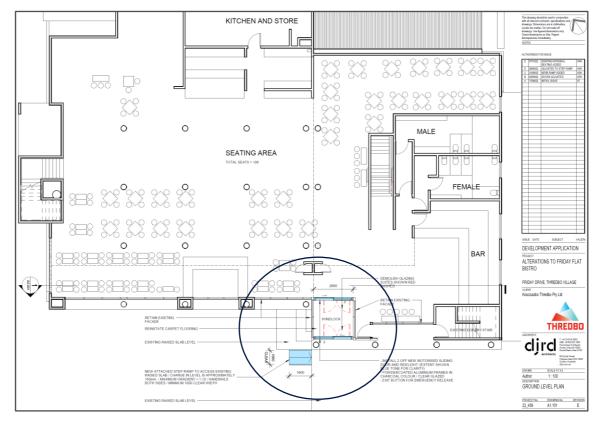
| Ground Level Plan of proposed works - circled (Source: Applicant's documentation)
